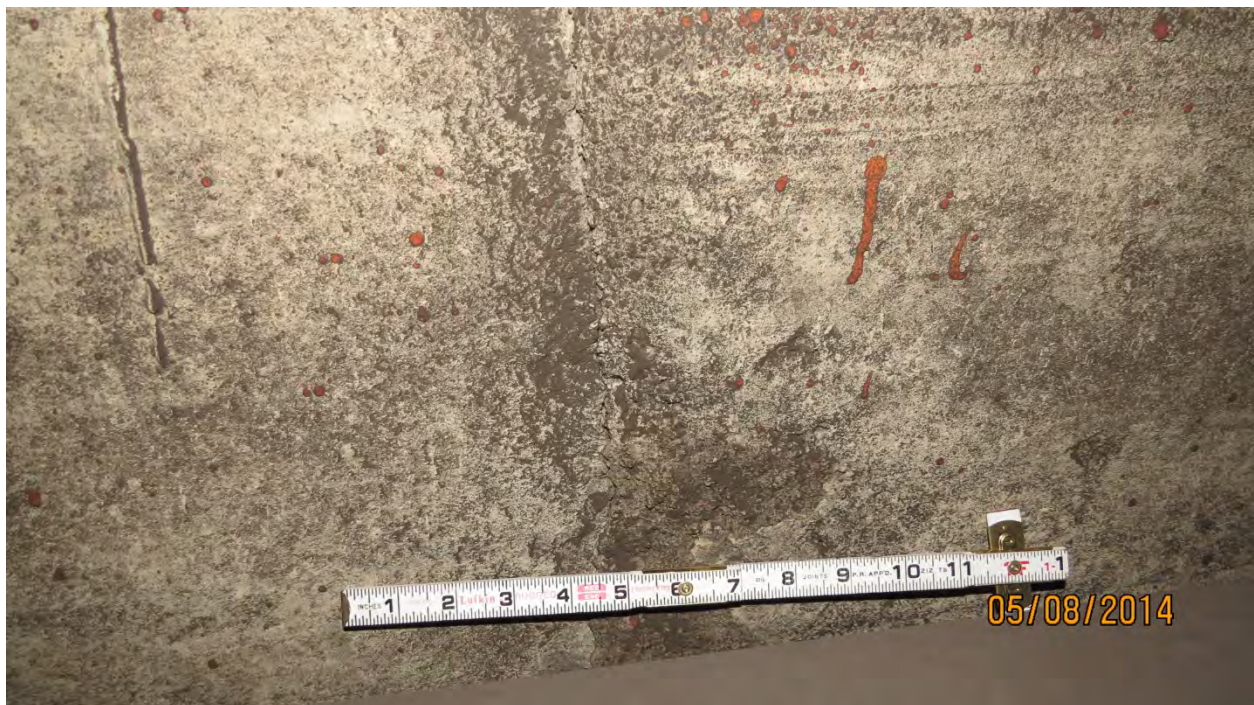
Close-Up of Transverse Moderate Crack up to 1/16" wide on North Wall, North Tube Station 232+51. Photo Ref. GK03-039, looking North.
